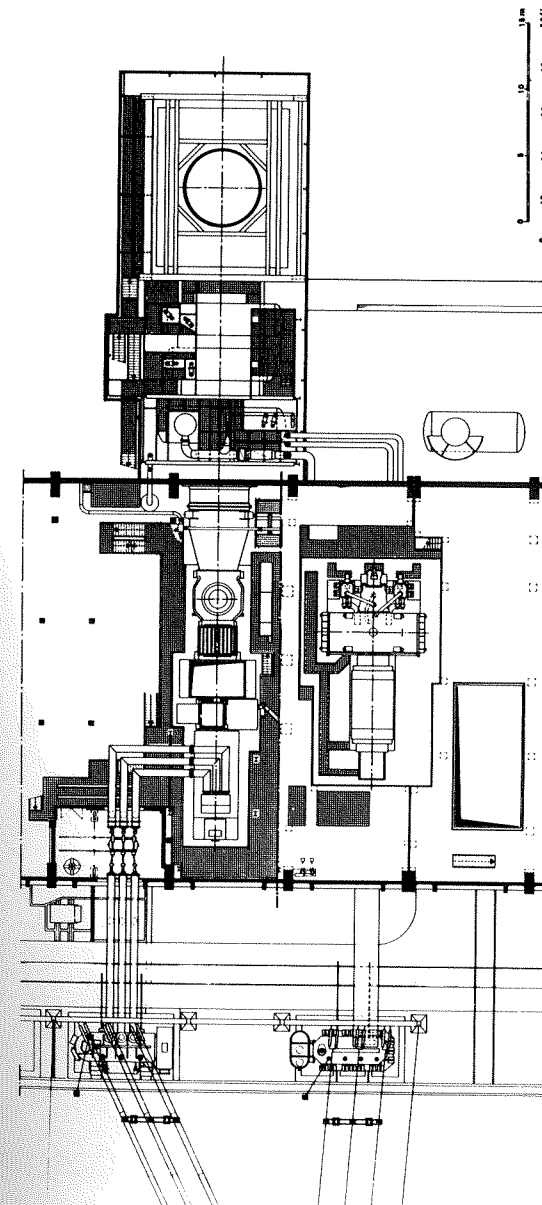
Layout of the 120 MW Combined-Cycle Plant at Korneuburg
